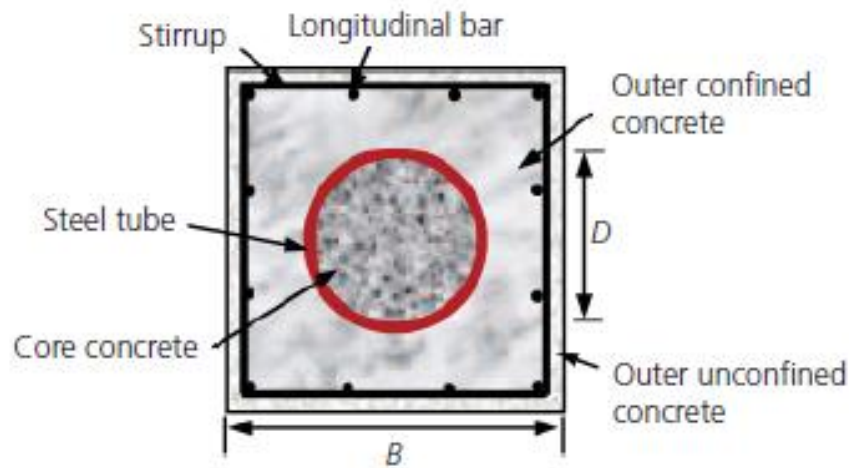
Typical cross-section of concrete-encased CFST (An et al., 2014)
